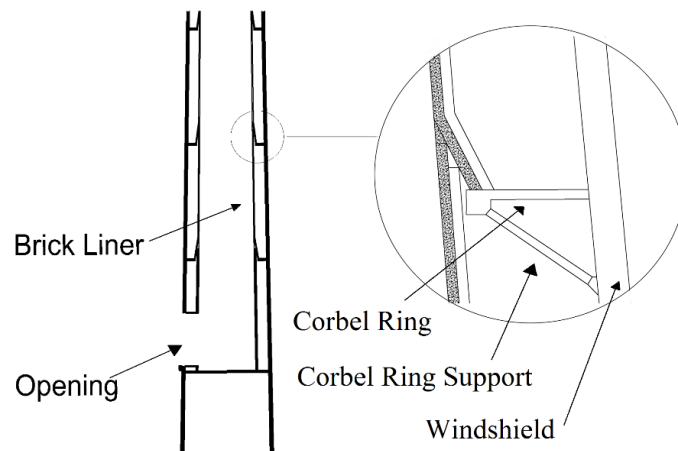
Brick liner and corbel ring details of the chimney 25F-5.
